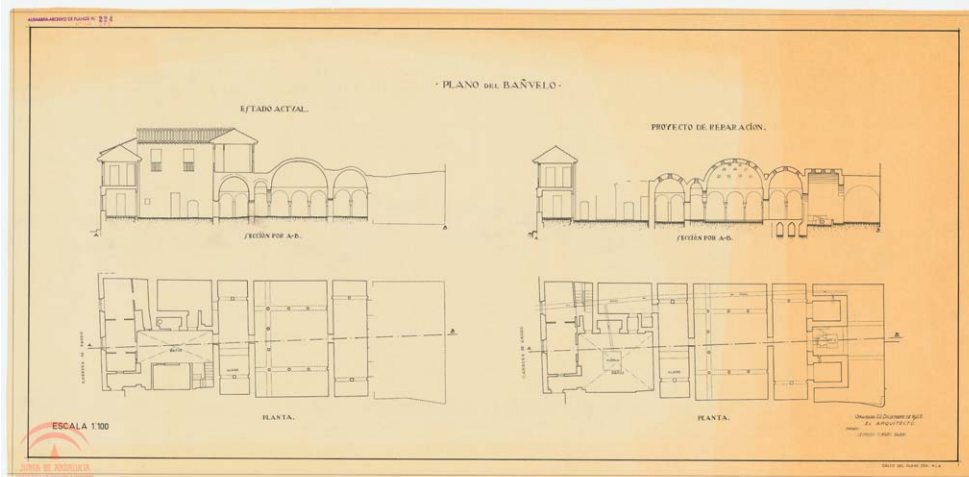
Project for the Repairs of El Bañuelo: Ground floor plan and cross-section, before and after the intervention (After L. Torres-Balbás, 1927, APAG P-000273).
